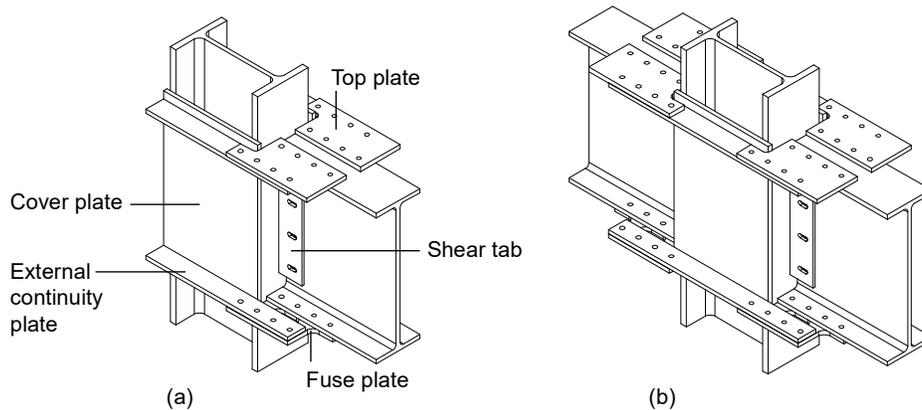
DuraFuse Frames (DFF) connections (a) one-sided with wide-flange beam and column (b) two-sided with wide flange beams and column.
